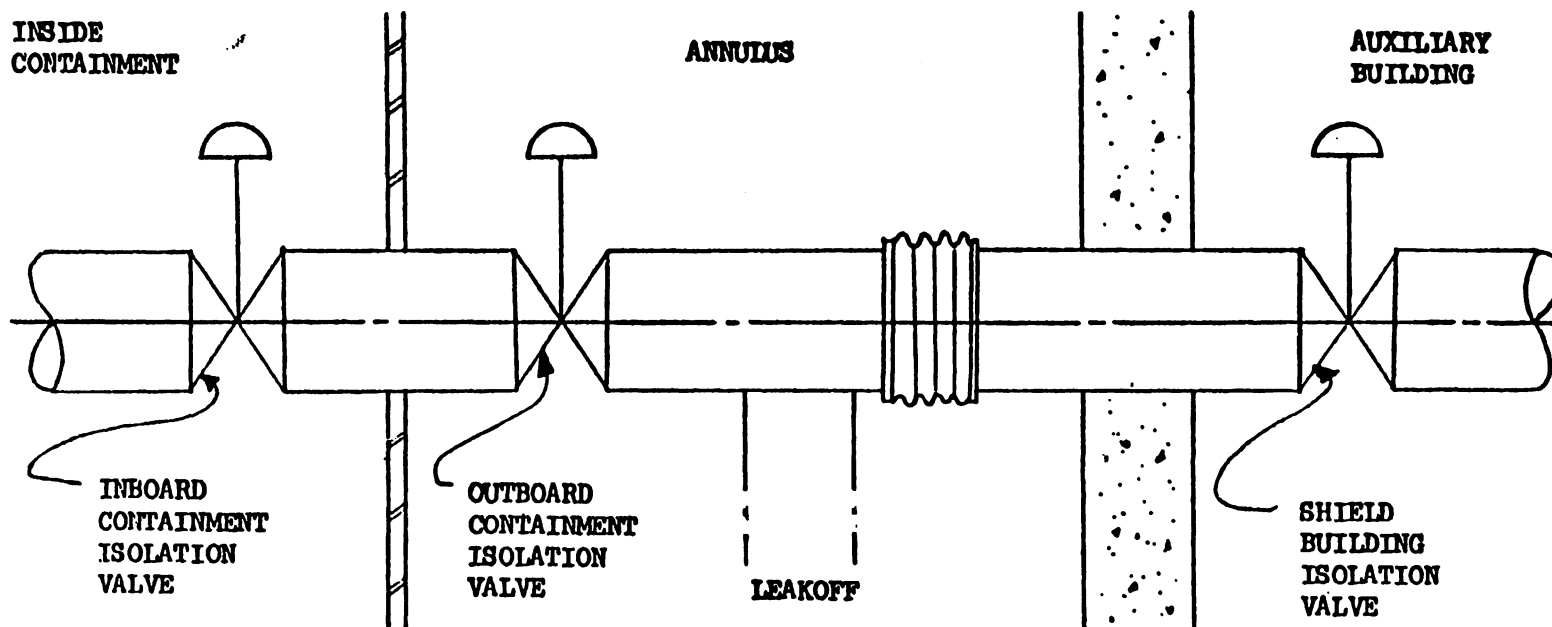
Typical Purge Penetration Arrangement
